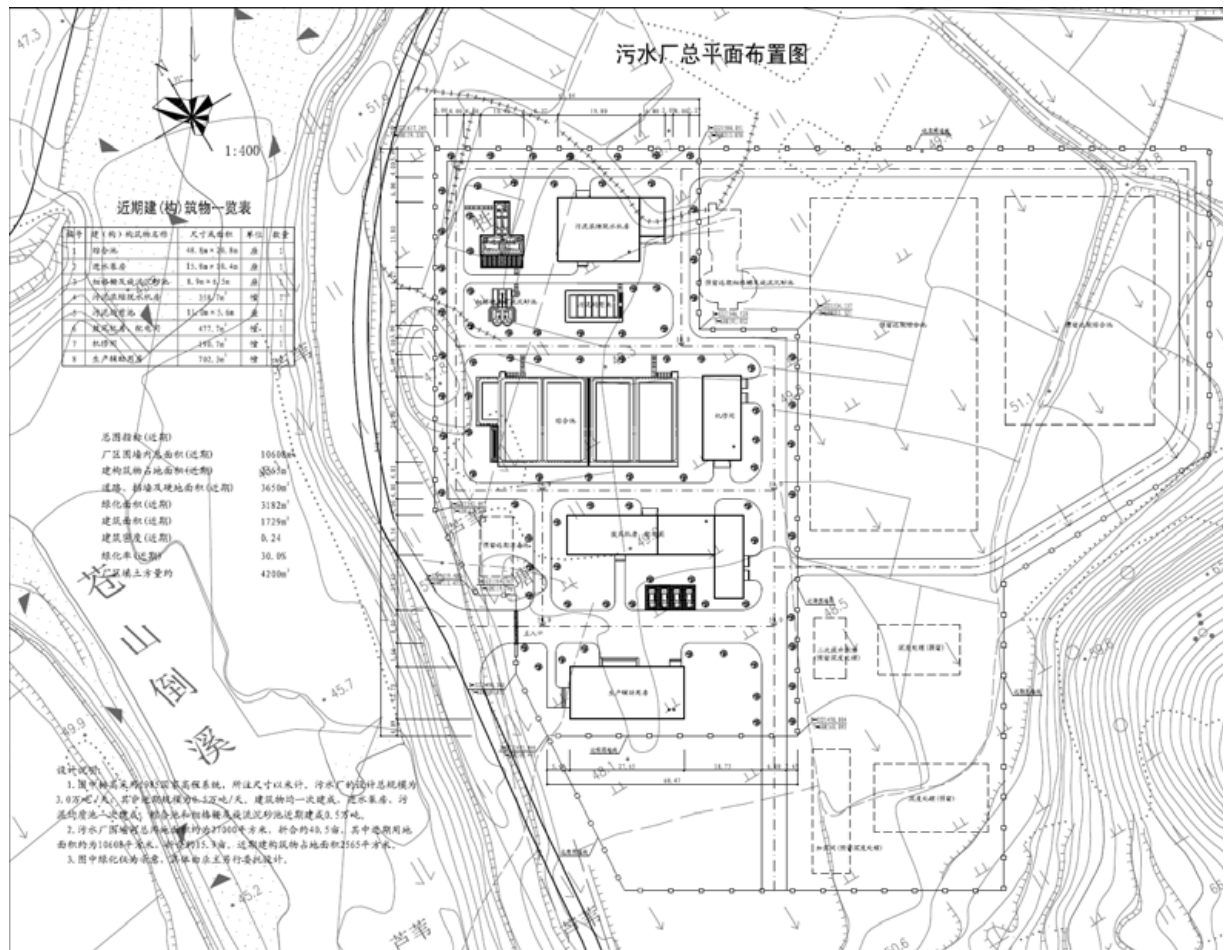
Layout Plan of Cangshan Sewage Disposal Plant of Tiantai County
